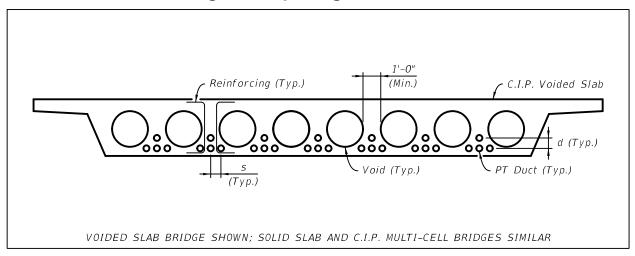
Section Through Slab or Multi-Cell Box Girder Bridge Showing Duct Spacings
